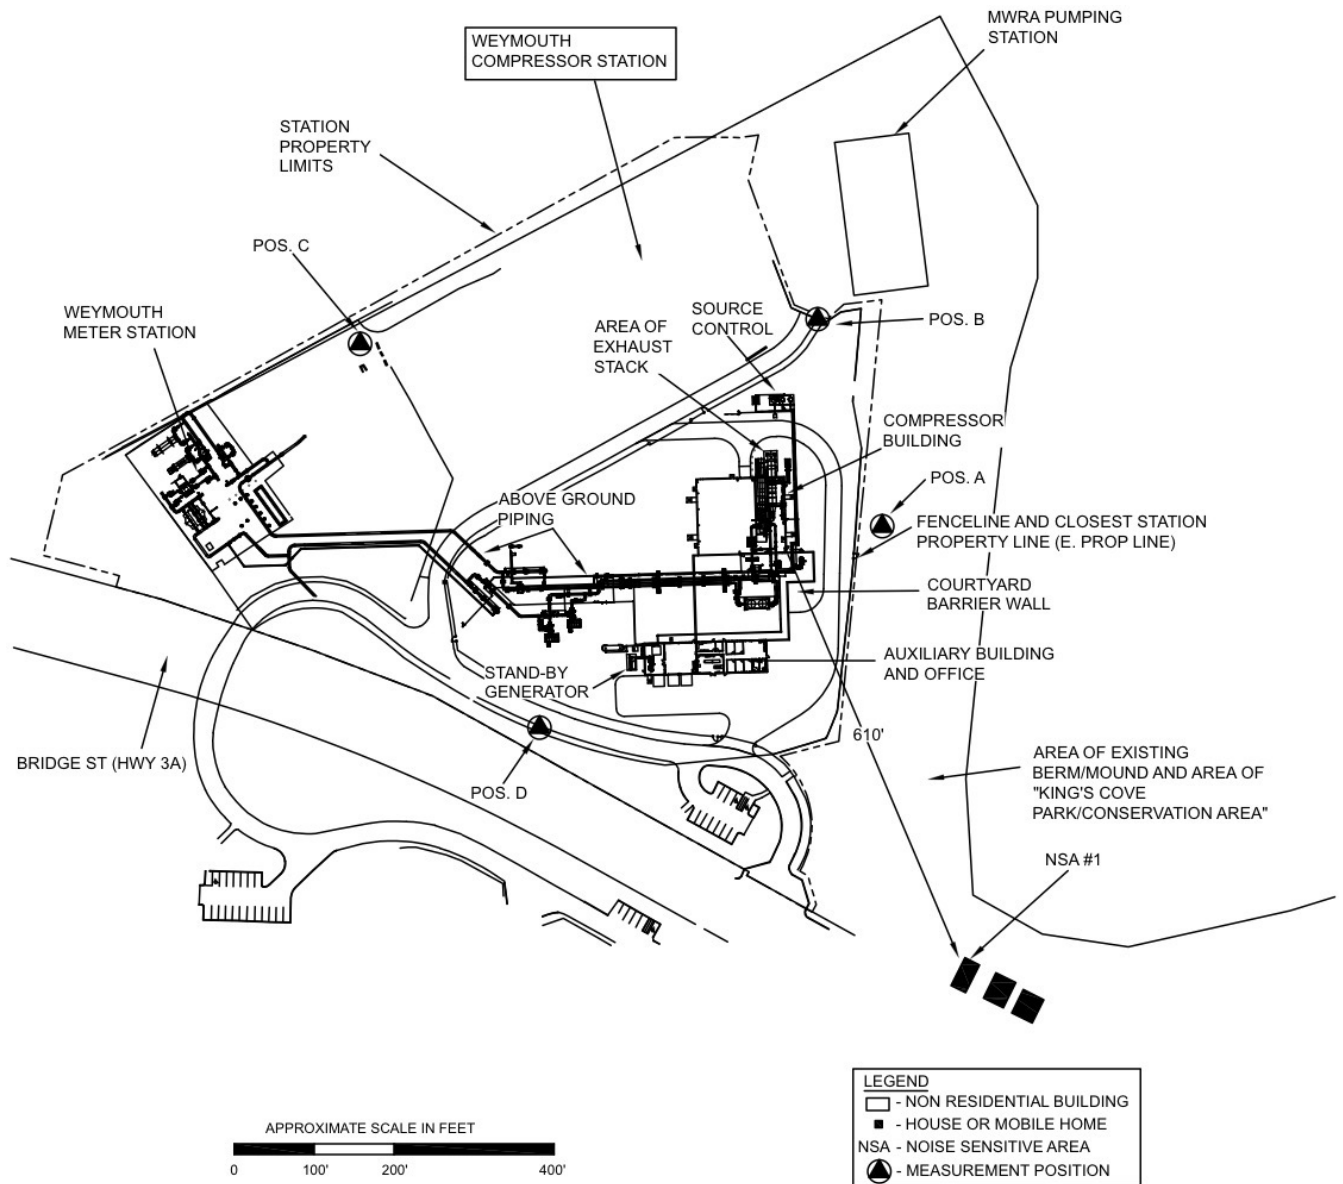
Weymouth Compressor Station: Drawing showing the Conceptual Layout of Station Equipment, Buildings, Aboveground Piping and Area of Courtyard Barrier/Walls.
